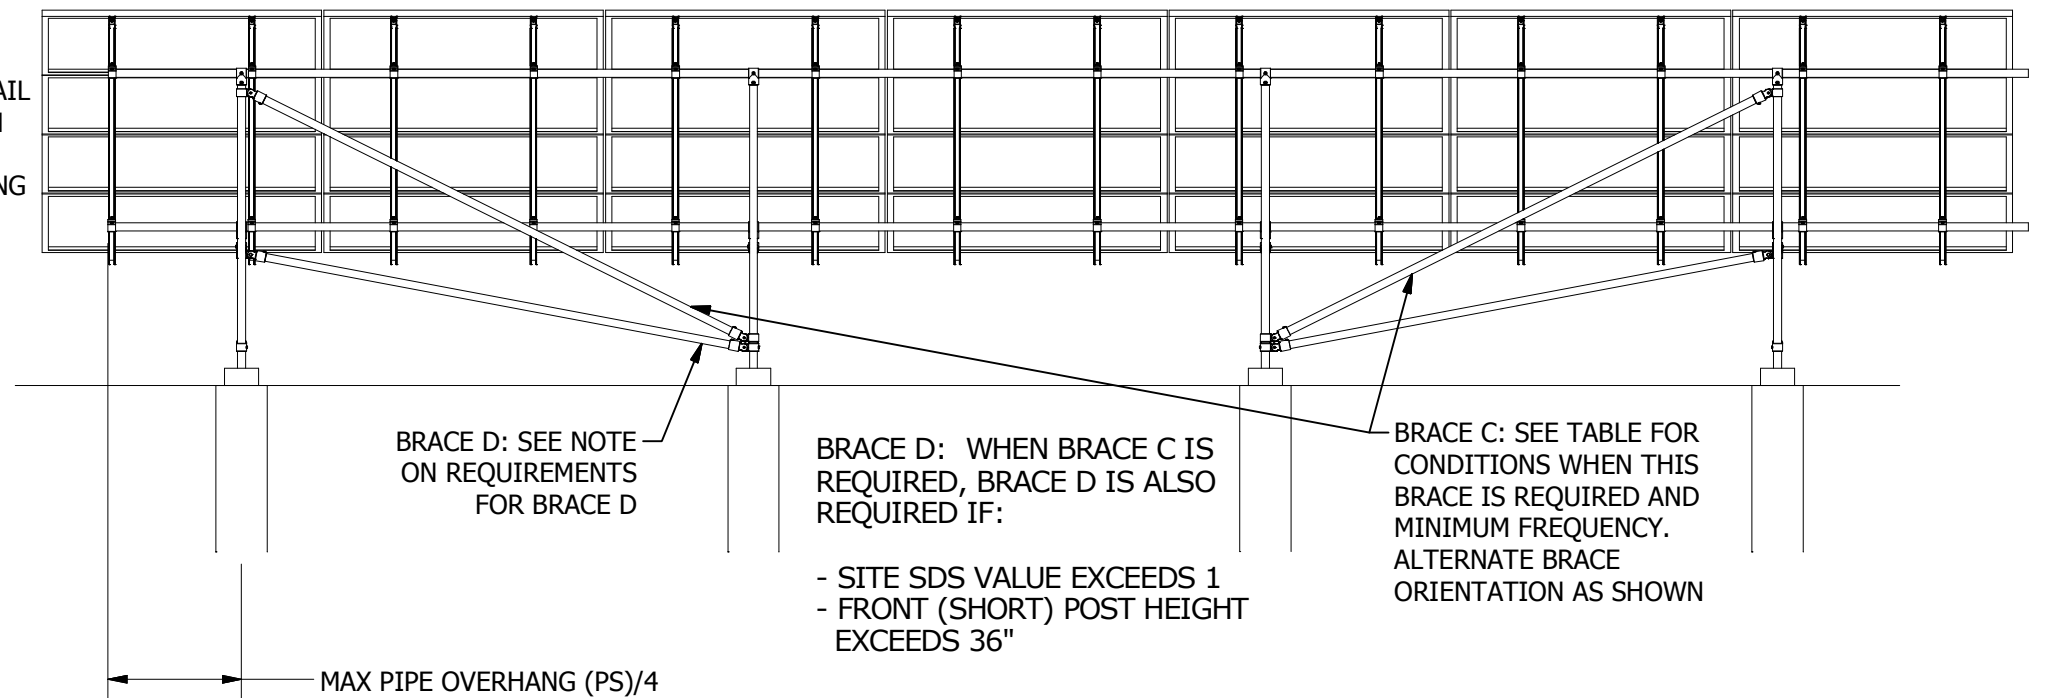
DETAILED VIEW OF PIPE TO RAIL AND BRACING INTERFACE
